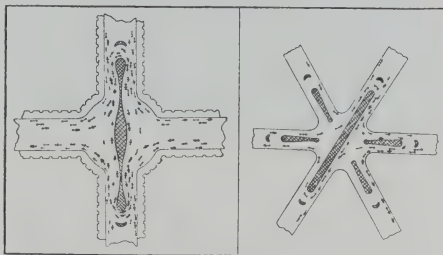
Sketch showing traffic flow consequent upon the installation of central platforms to overcome traffic congestion.
